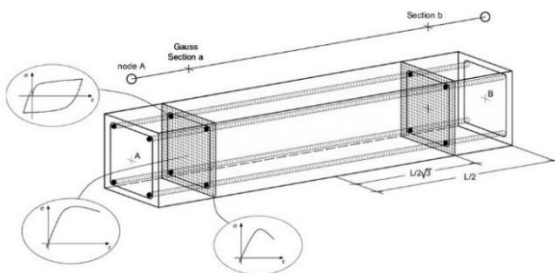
Discretization of a typical reinforced concrete cross-section [23].
